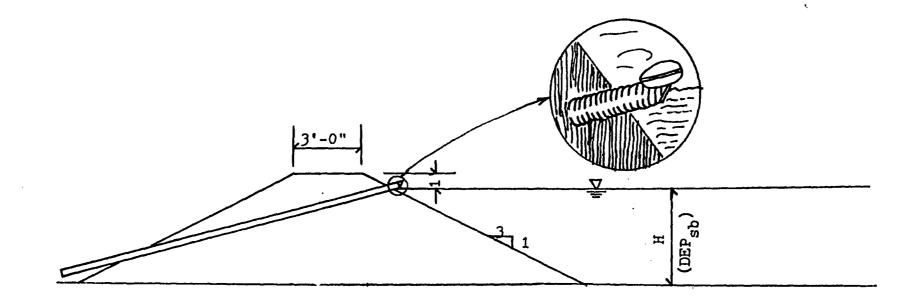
Cross Section of Sediment Basin Dike with Hood Inlet Spillway. (No Scale)
